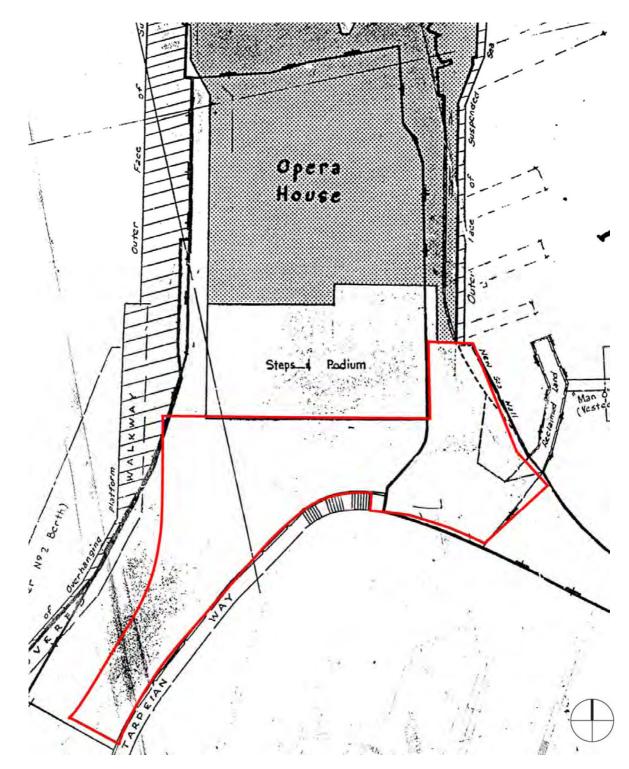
c1973 plan of the Sydney Opera House site, indicating the new section of seawall constructed along the eastern shoreline. The study area is outlined. (Source: To be confirmed)
